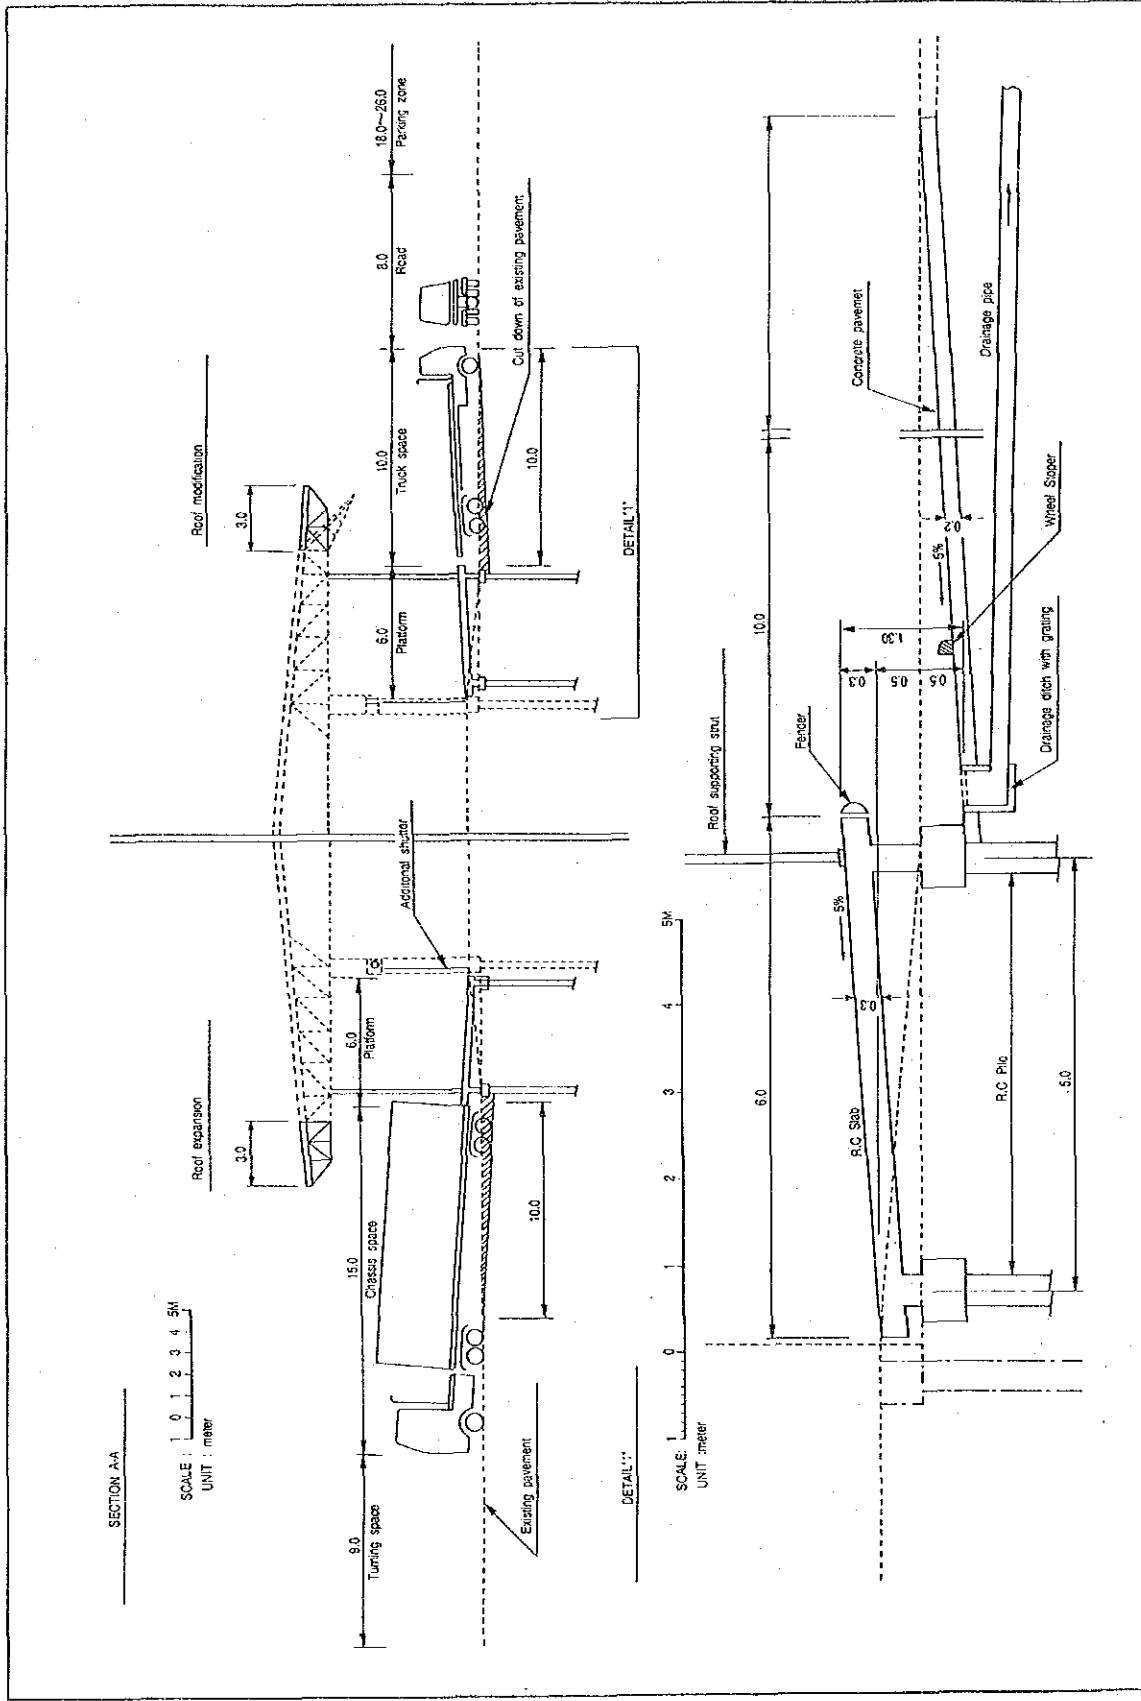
Modification Plan of Transit Shed No.13, 14
